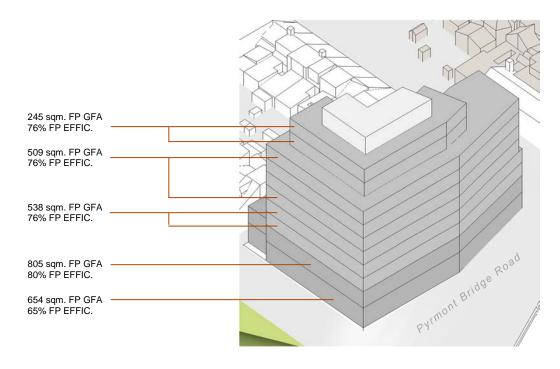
isometric of mixed use scheme for 46-48 Pyrmont Bridge Road
